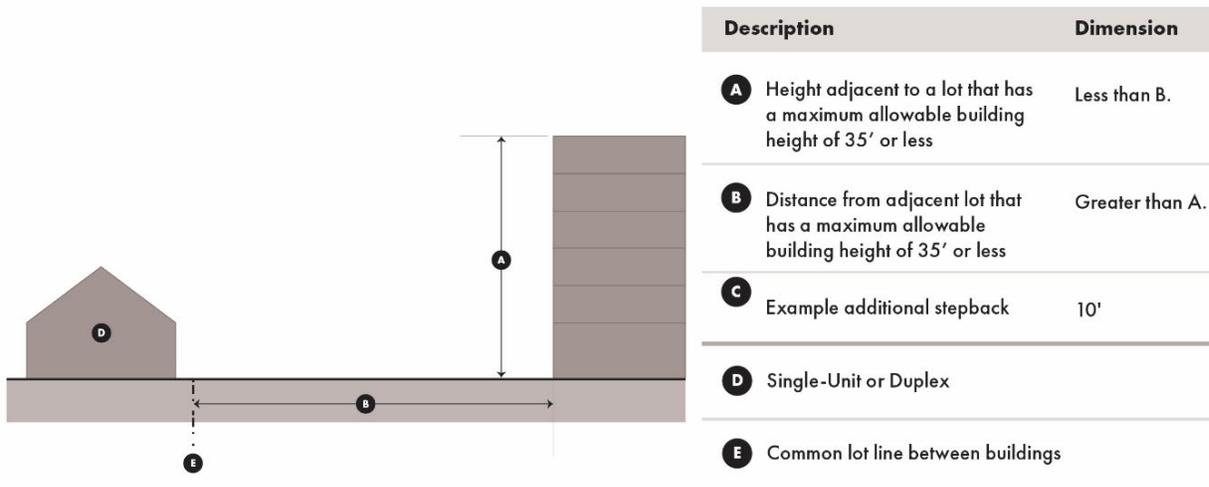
W: Example of 65 ft tall building adjacent to a lot that has a maximum building height of 35’ or less (or separated by an alley) which does not require upper floor step-backs because it has a horizontal distance from the common lot line greater than the height of the building.
